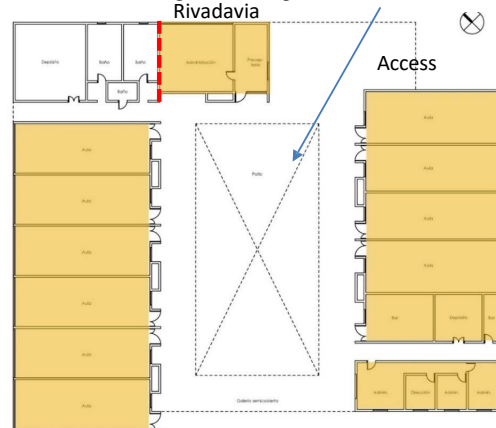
Floor plan (Source: Julián Basualdo Rapetti and María Belén Birche)
